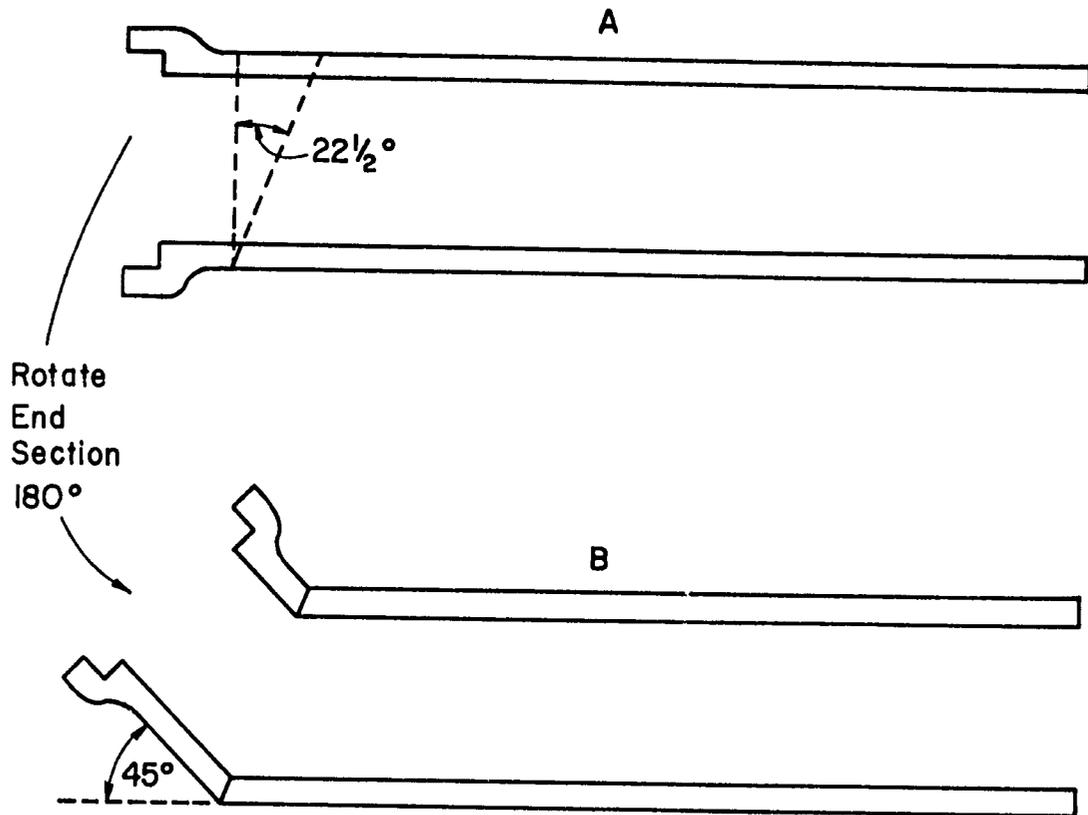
Steps in manufacture of 45° angle concrete pipe.
